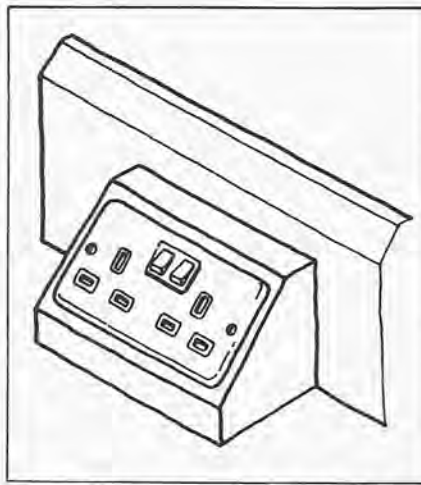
Outlet pedestal box used against a low skirting to provide socket outlets
